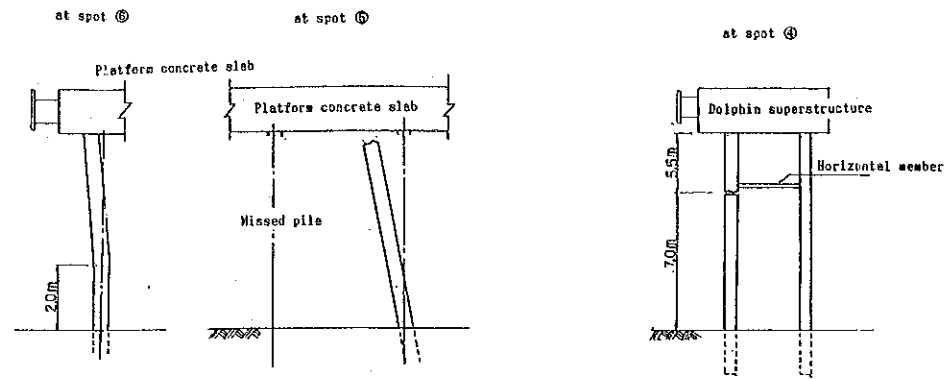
Detail of Deformed Spots at Berth No. 12
